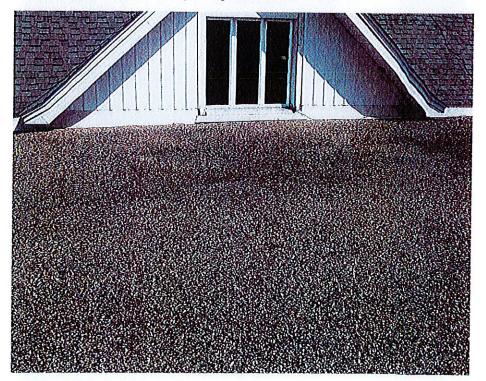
View of the tar and gravel roof (not sampled due to possible future leakage).
